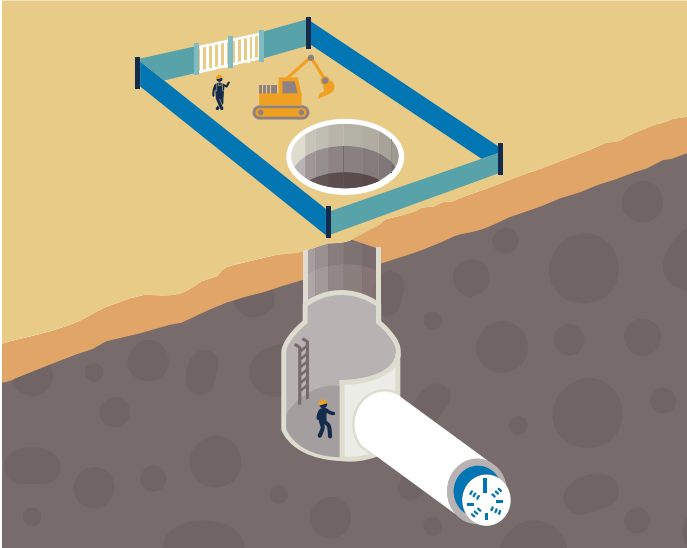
Vertical shafts are the doorways to underground tunnels where all materials enter and exit.
